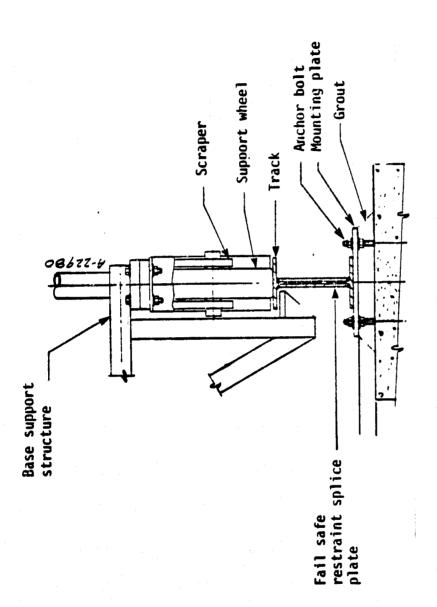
Track attachment. (Excerpt from Drawing 6848-004)
